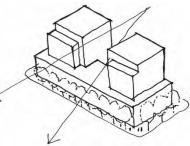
Slender building forms enhance daylight penetration and cooling through cross ventilation.
